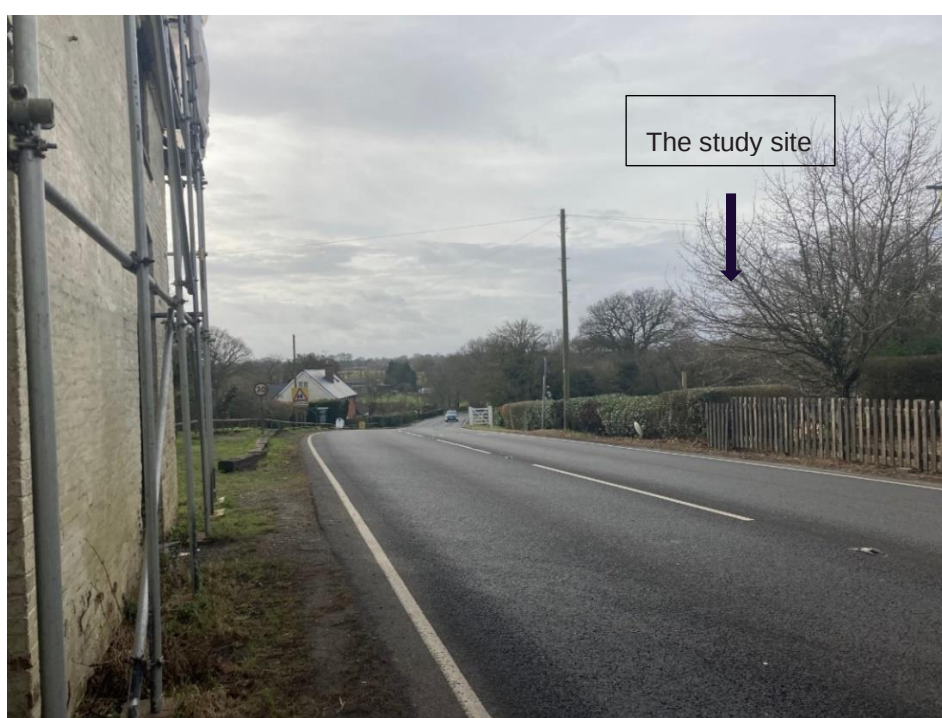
The Stable of the Bull Inn (List entry 1070807) looking south onto Ashford Road
